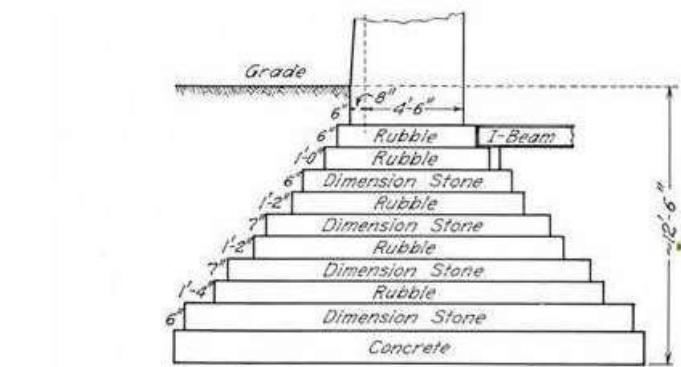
SECTION THROUGH EXTERIOR PIER OF HOME INSURANCE BUILDING
